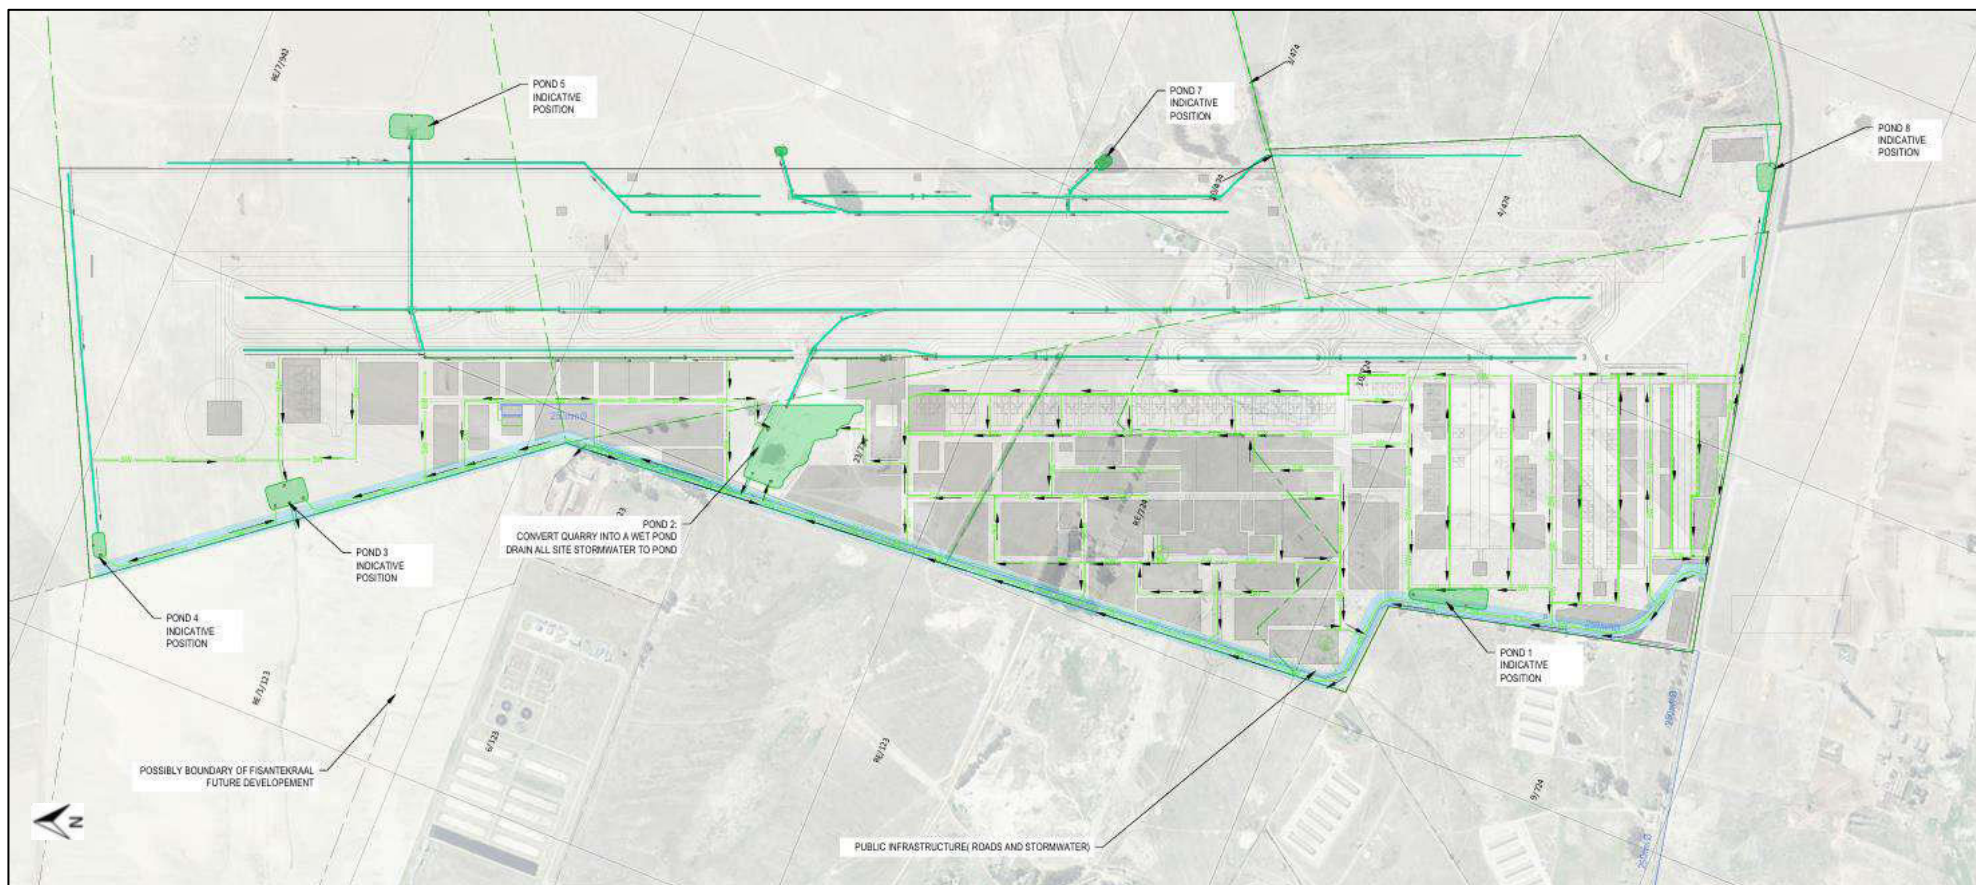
Proposed stormwater layout (Zutari, Engineering Services Report, January 2025)
